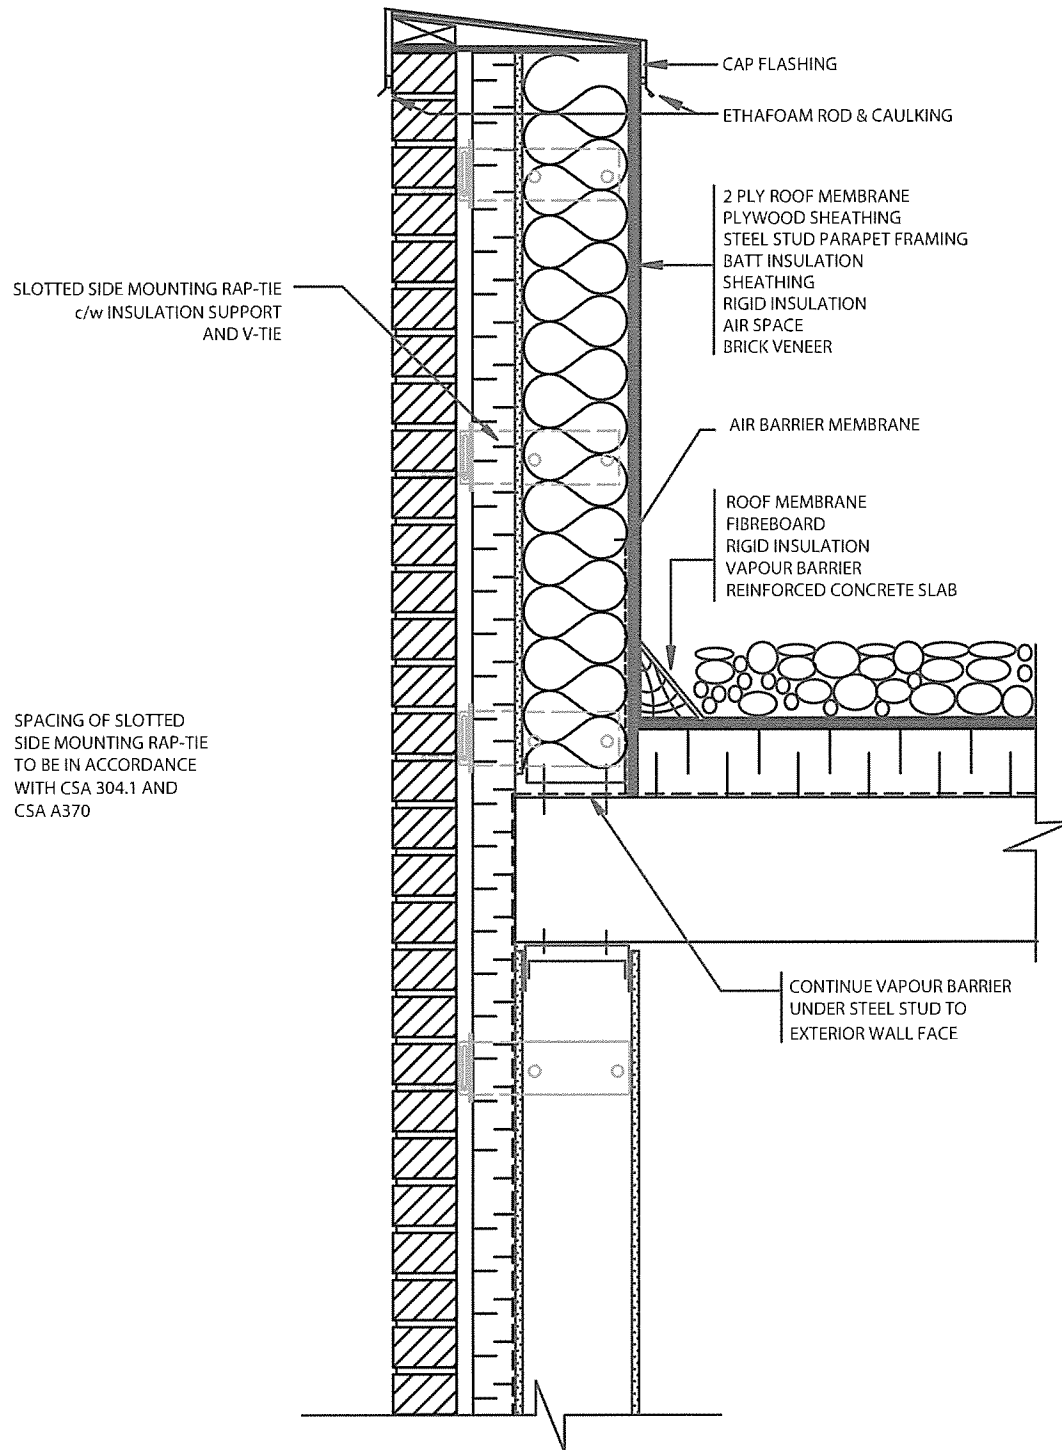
BRICK VENEER / STEEL STUD - DETAIL AT HIGH PARAPET
